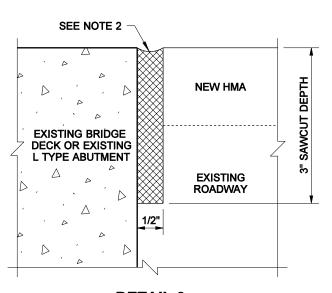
1/2" JOINT SEAL BRIDGE DECK WITH CONCRETE OVERLAY
